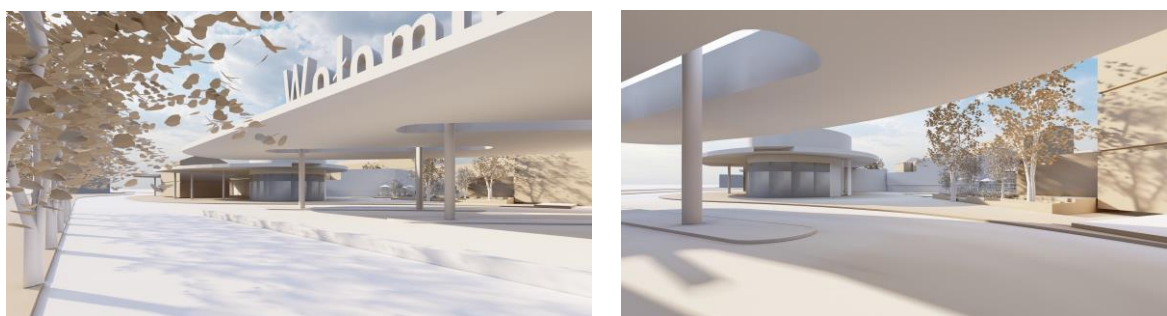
i 7. Version No. 2 – A more conservative version, conforming to the existing road layout and existing space - a three-dimensional model of the Wołomin railway station areas. Source: ©Armageddon Biuro Projektowe: Robert Barełkowski, Łukasz Wardęski, Łukasz Rosiak, Alicja Barełkowska, Adriana Szubryt, 2022
